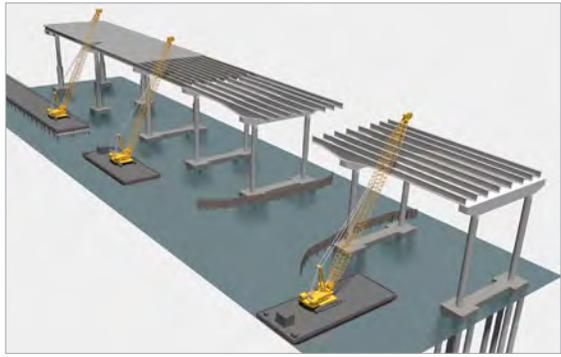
HRB Sequence Step 3. Install bridge beams and diaphragms. Beams erected from the water will be delivered by barge, including structural steel for three spans at the navigable channel and the 196-ft. precast concrete beams. Beams erected by land-based equipment will be delivered by truck. GPC will coordinate structural steel installation with the USCG, while PCBT installation over Bainbridge Boulevard, Libertyville Road, and rail lines require in-depth coordination.
